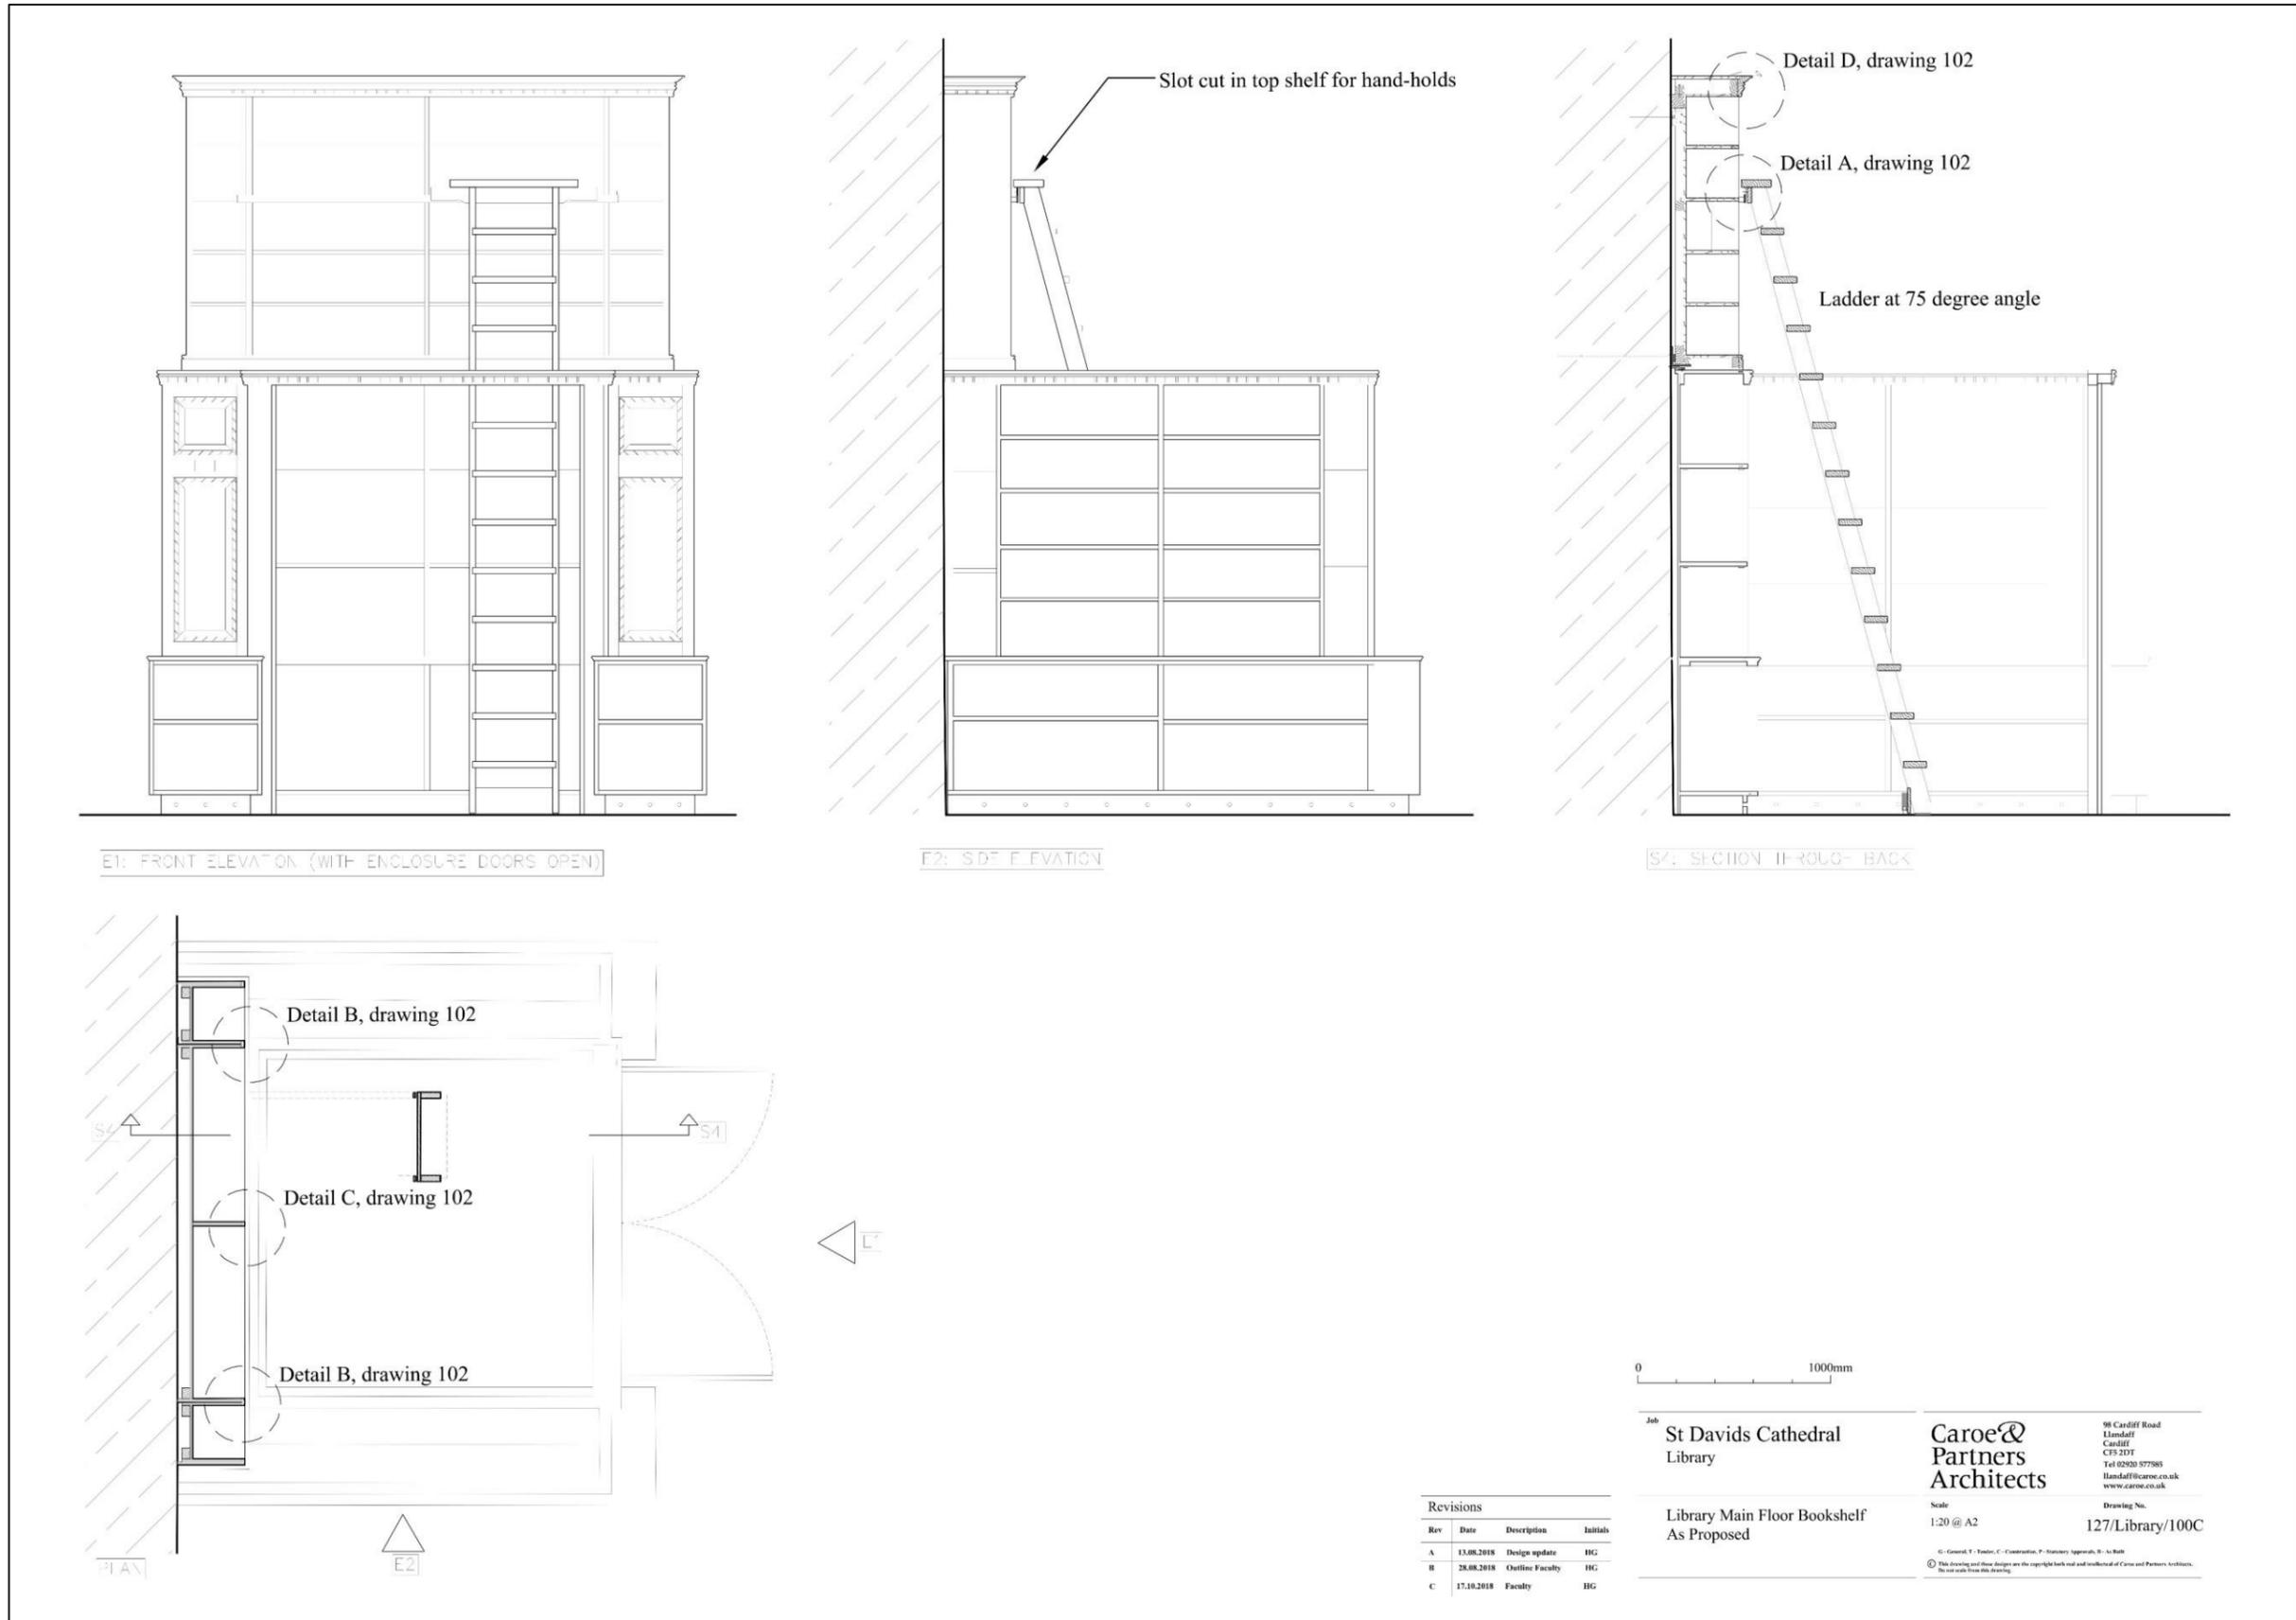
Shelving as Proposed – Library – St Davids Cathedral. © Caroe & Partners Architects
